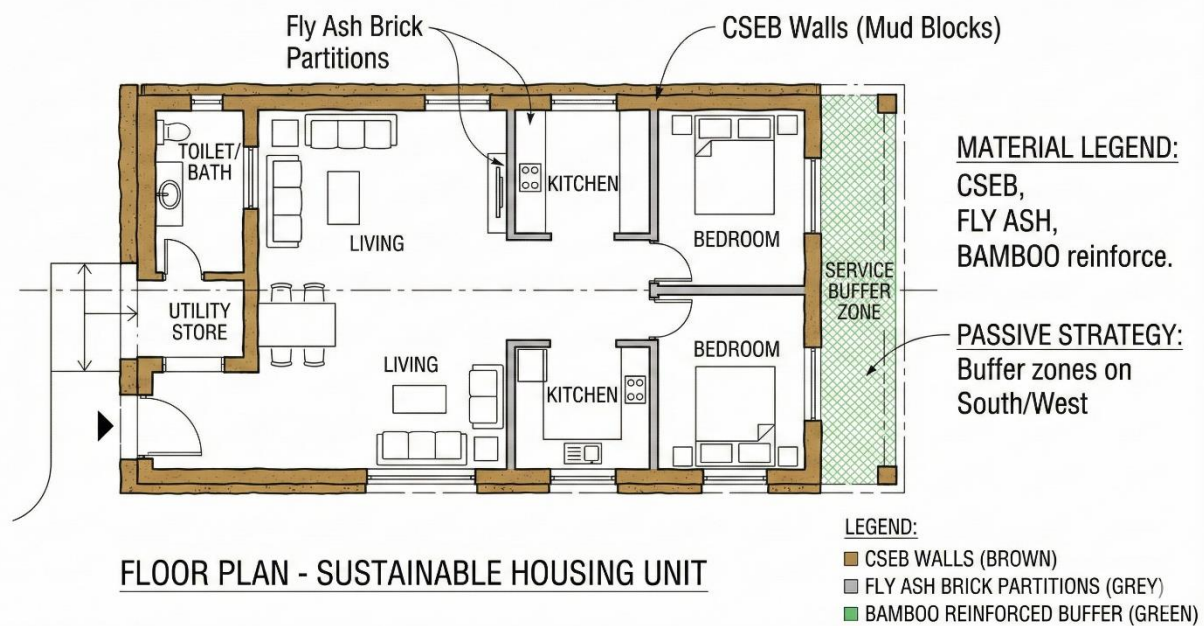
Floor Plan - Sustainable Housing unit (Case B)
